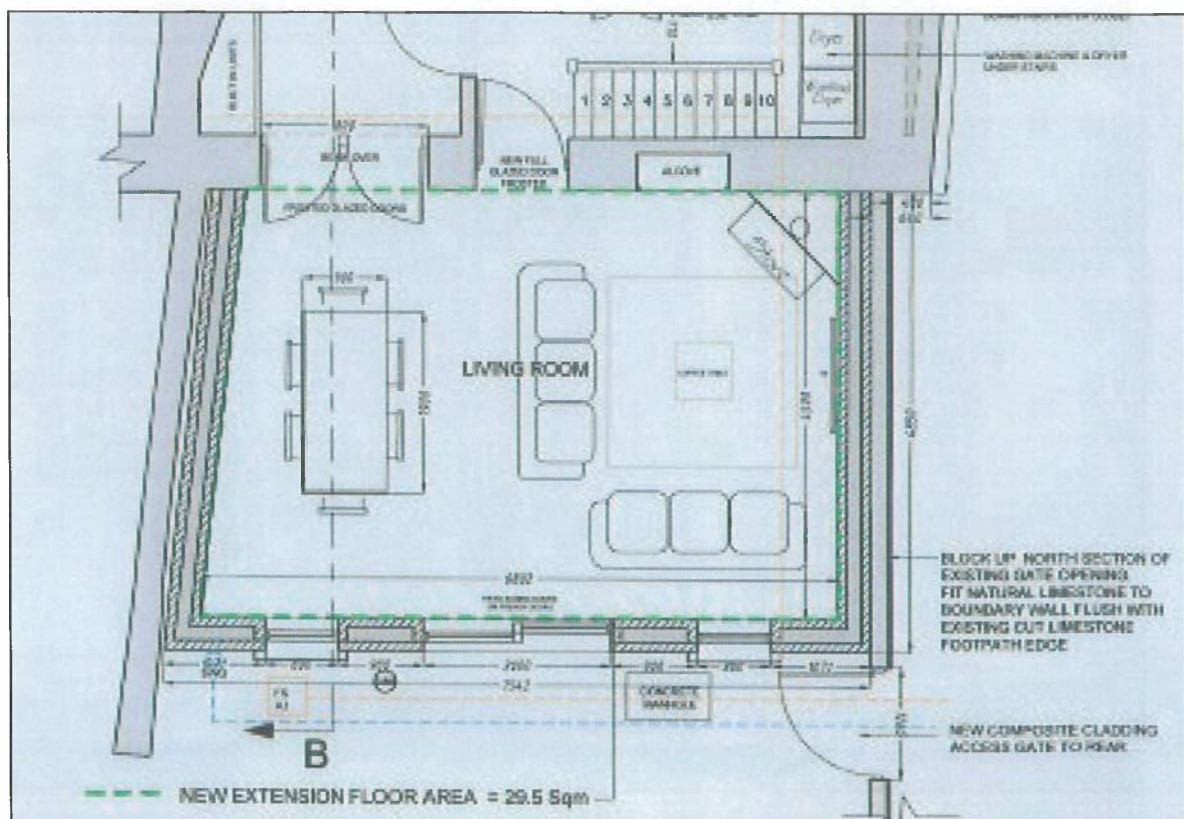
Proposed floor plan (as submitted) – note proposed ground floor extension of 29.5m².
